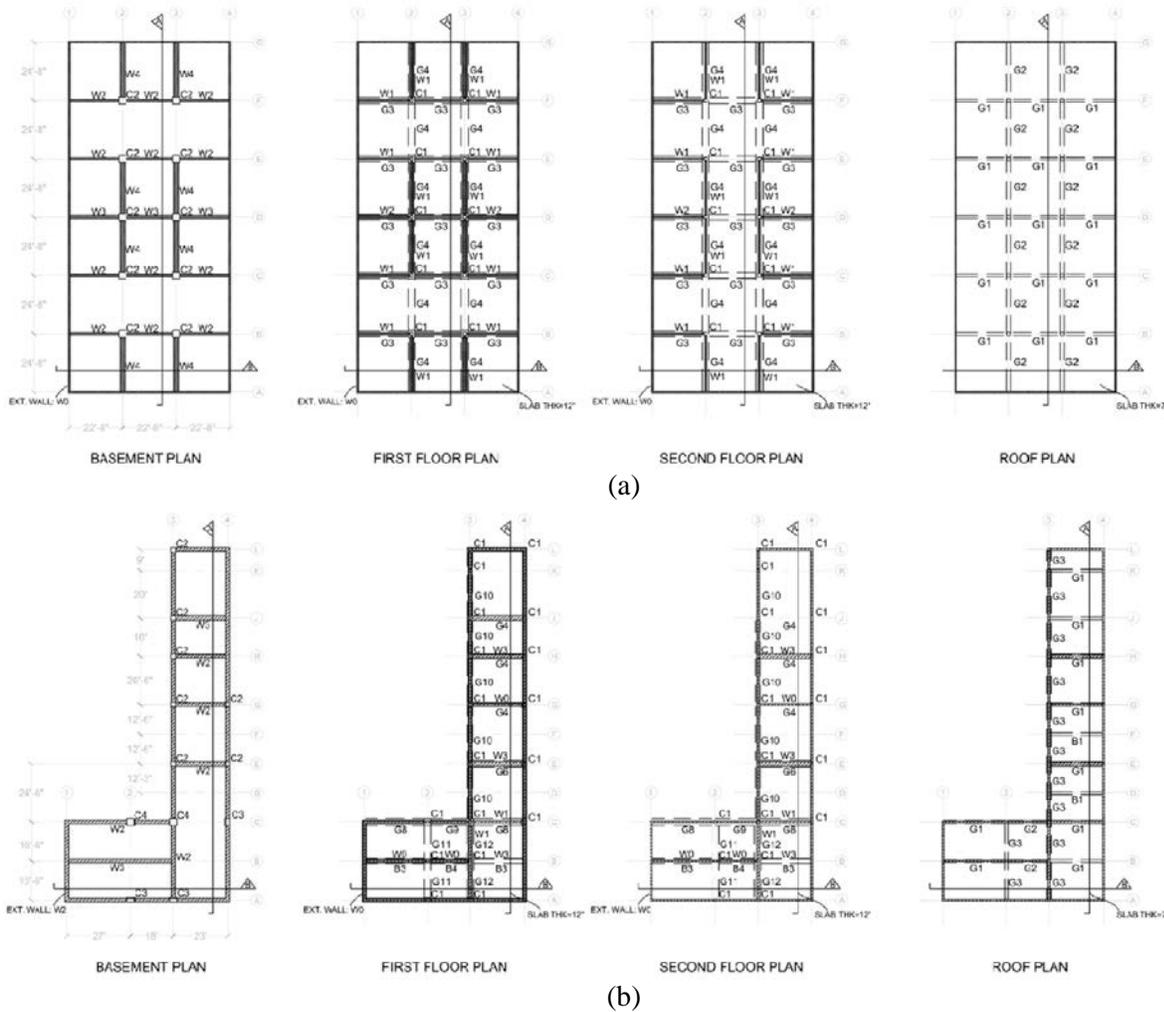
Structural plan view for additional building cases: a) Case 0, and b) Case 5
